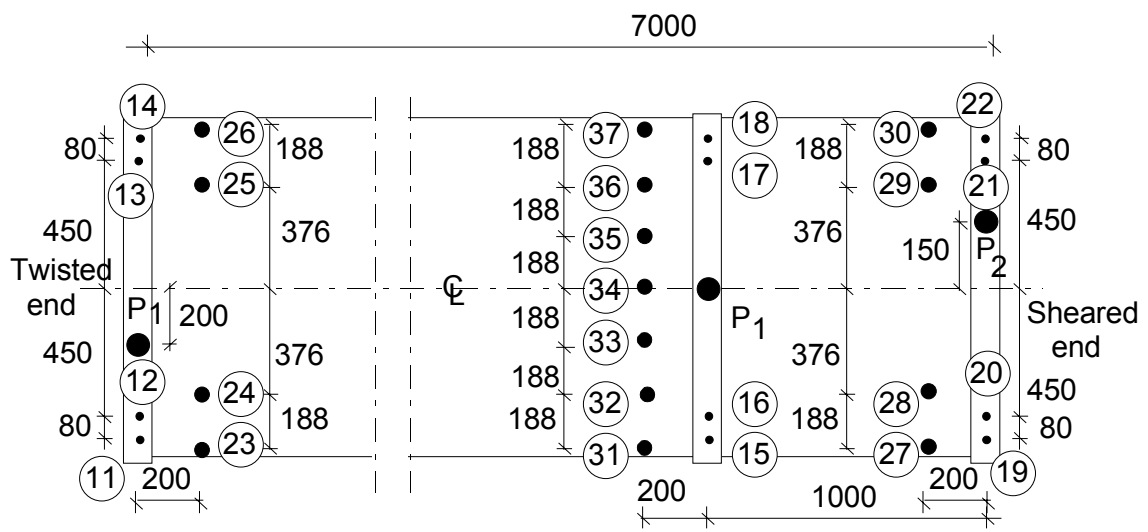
ST400G, plan. Location of loads and vertical transducers 11–37.
